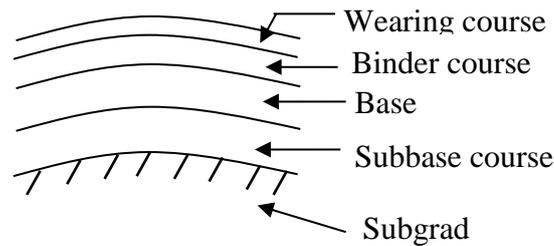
A typical cross-section of the bituminous concrete runway pavement
